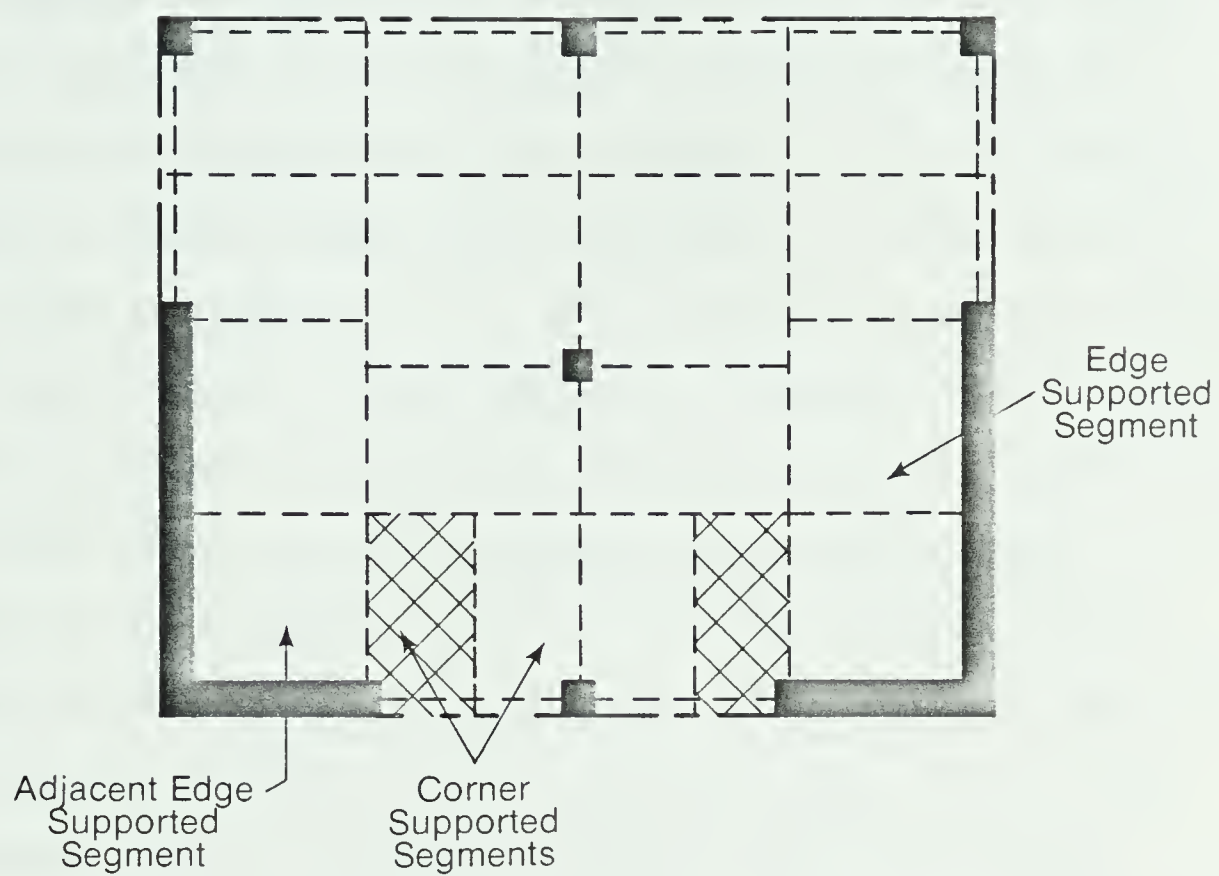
Slab Showing Adjacent Supported Segments with Discontinuous Edges
